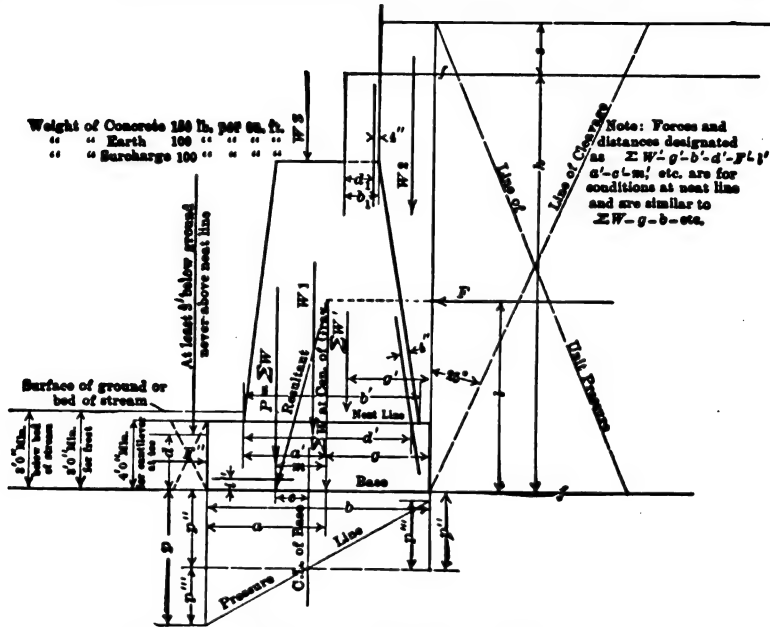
DESIGN OF ABUTMENTS. PENNA. RY. CO.
